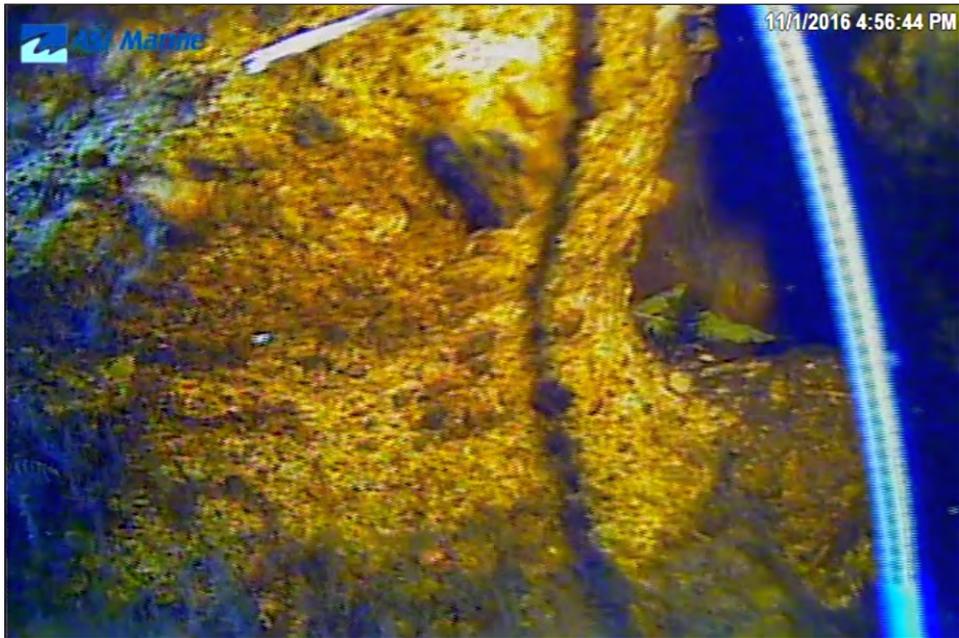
B-10: 19.6 m - Joint spalling and wooden structure.
